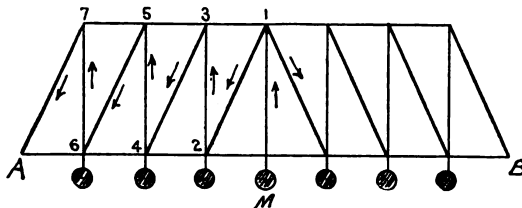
Skeleton View of a Howe Truss Uniformly Loaded at Each of its Panel Points.
